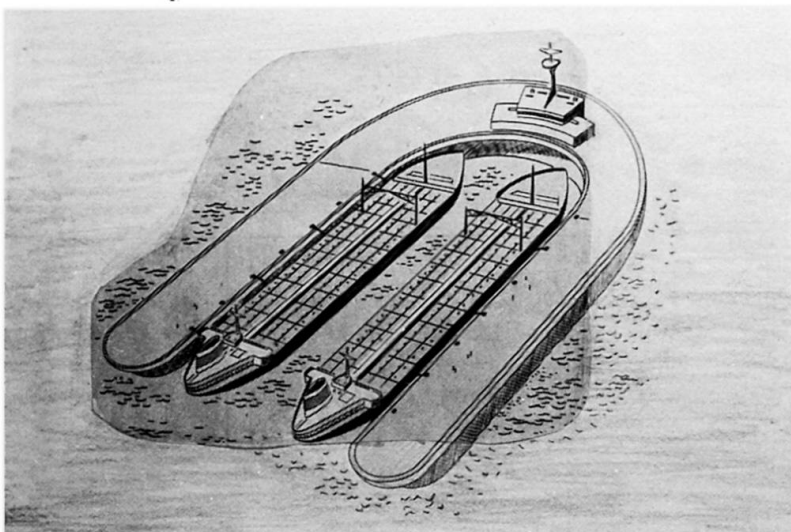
Concrete floating harbor proposed by Ulrich Finsterwalder.
